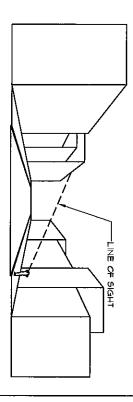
Rooftop elements such as mechanical penthouses, exposed mechanical equipment, and satellite dishes should not be visible from the public right-of-way.
